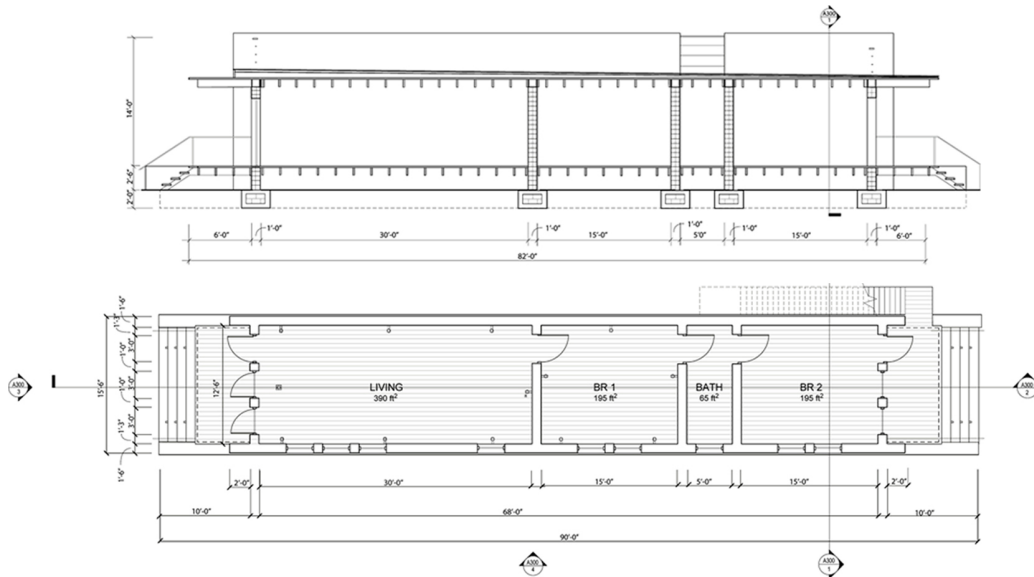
Shotgun housing prototype plan (bottom) and section (top) drawings. Source: (Author)
